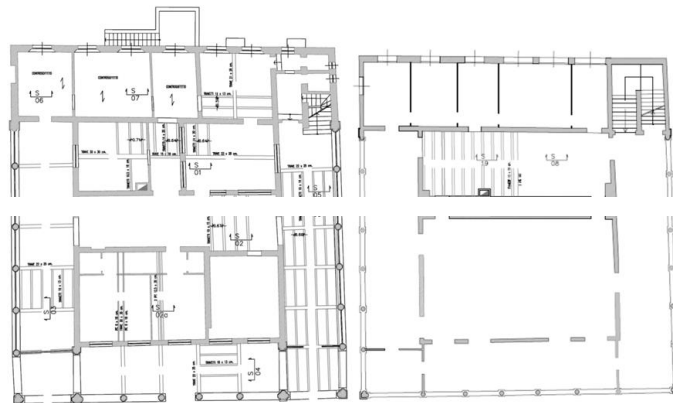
\_Plan view of ground floor and first floor with openings' positions (used to examine the floors' structure).
